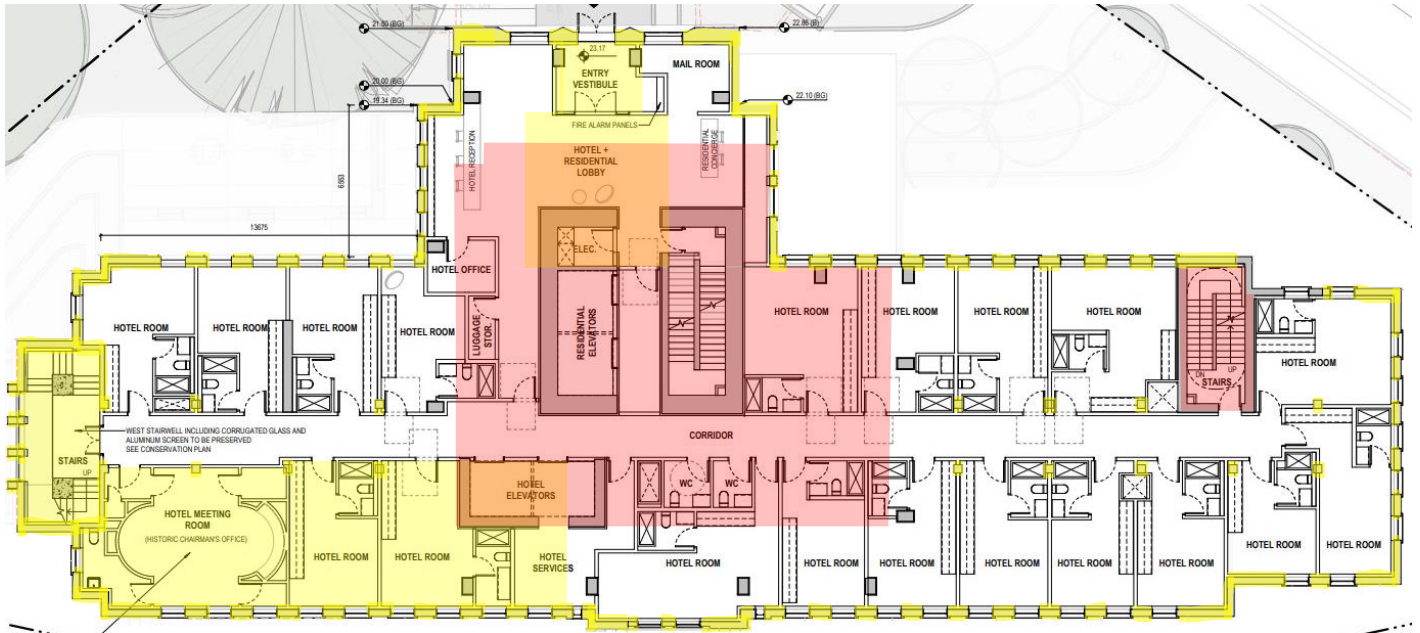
Proposed Level 3 Floor Plan. Retention of building and structure. The Conference Room (Chairman's Office) and West Entrance Stairwell are also fully retained. Art Deco features in the vestibule, lobby, and the Secretary and Commissioner's Offices will be retained and reused. Internal configuration is relatively maintained. Source: omb Architects + Designers architectural drawings, February 17, 2023.
